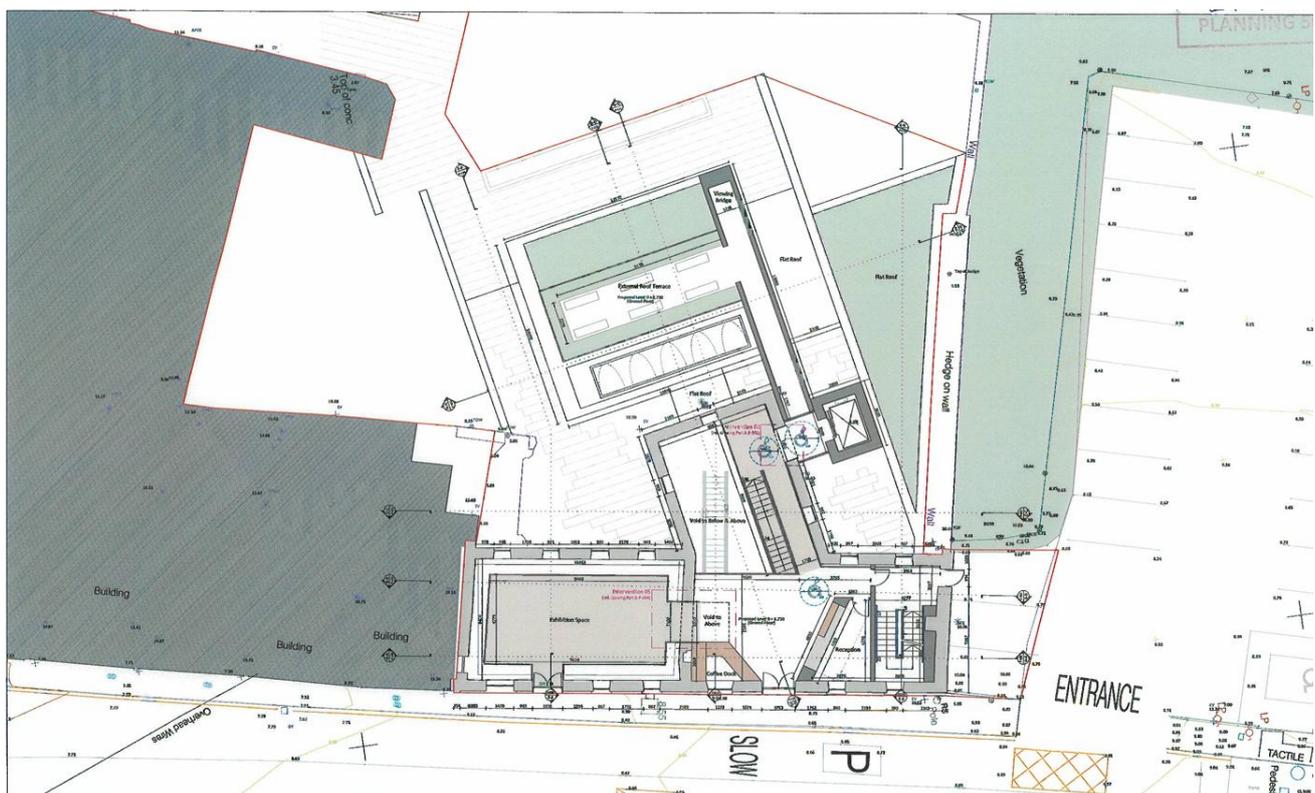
Ground floor layout plan for Grainstore redevelopment Approved Under Ref. LAC2401
